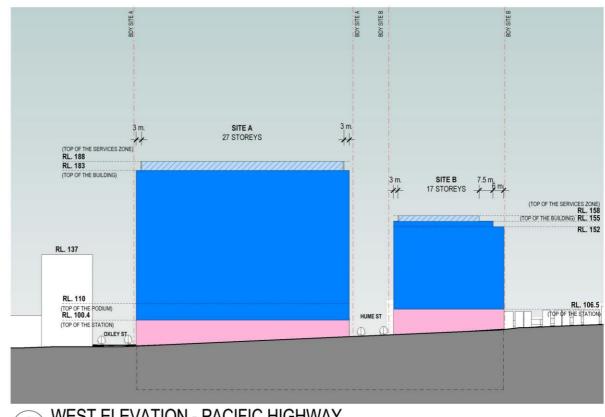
OSD architectural design illustrations showing footprint, floorplan and setbacks (Source: Sydney Metro).
